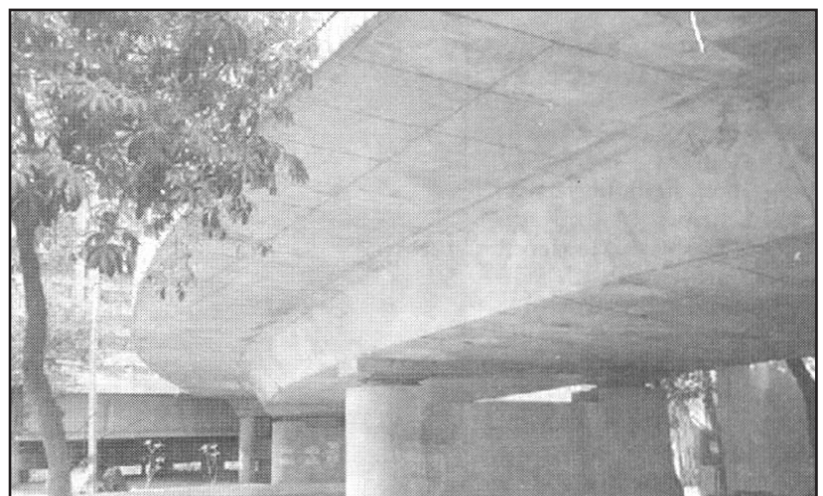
Clover Leaves at ITO in Delhi: Voided slabs prestressed deck on capsule shaped piers
